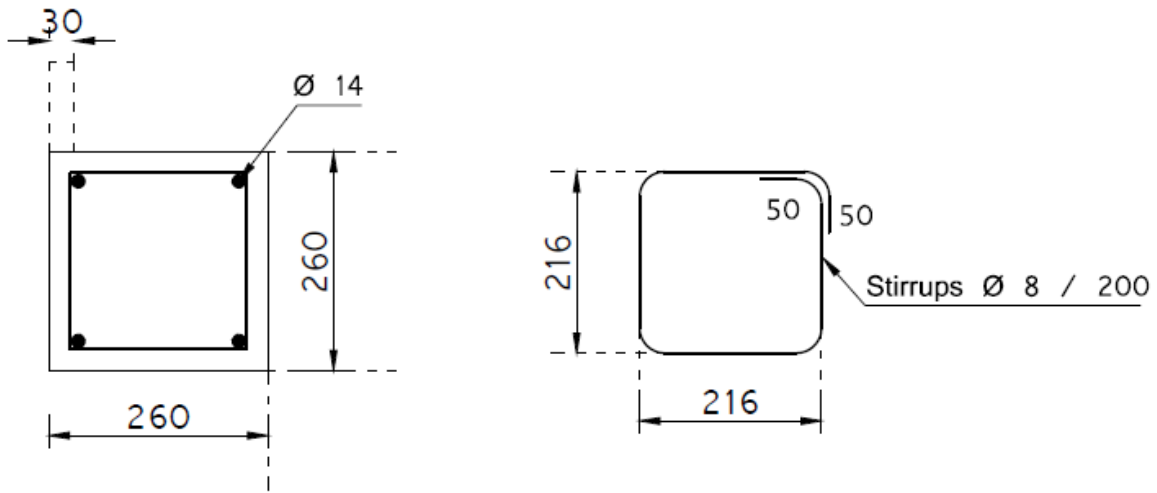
Section details of 2<sup>nd</sup> Storey columns
